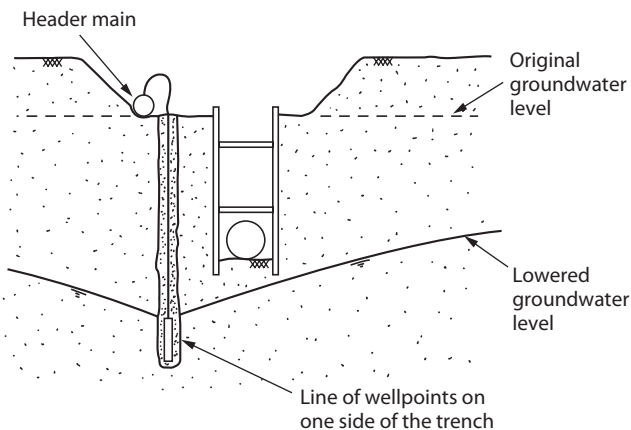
Single-sided wellpoint system. The section shows a trench with a line of wellpoints close to one side of trench.
